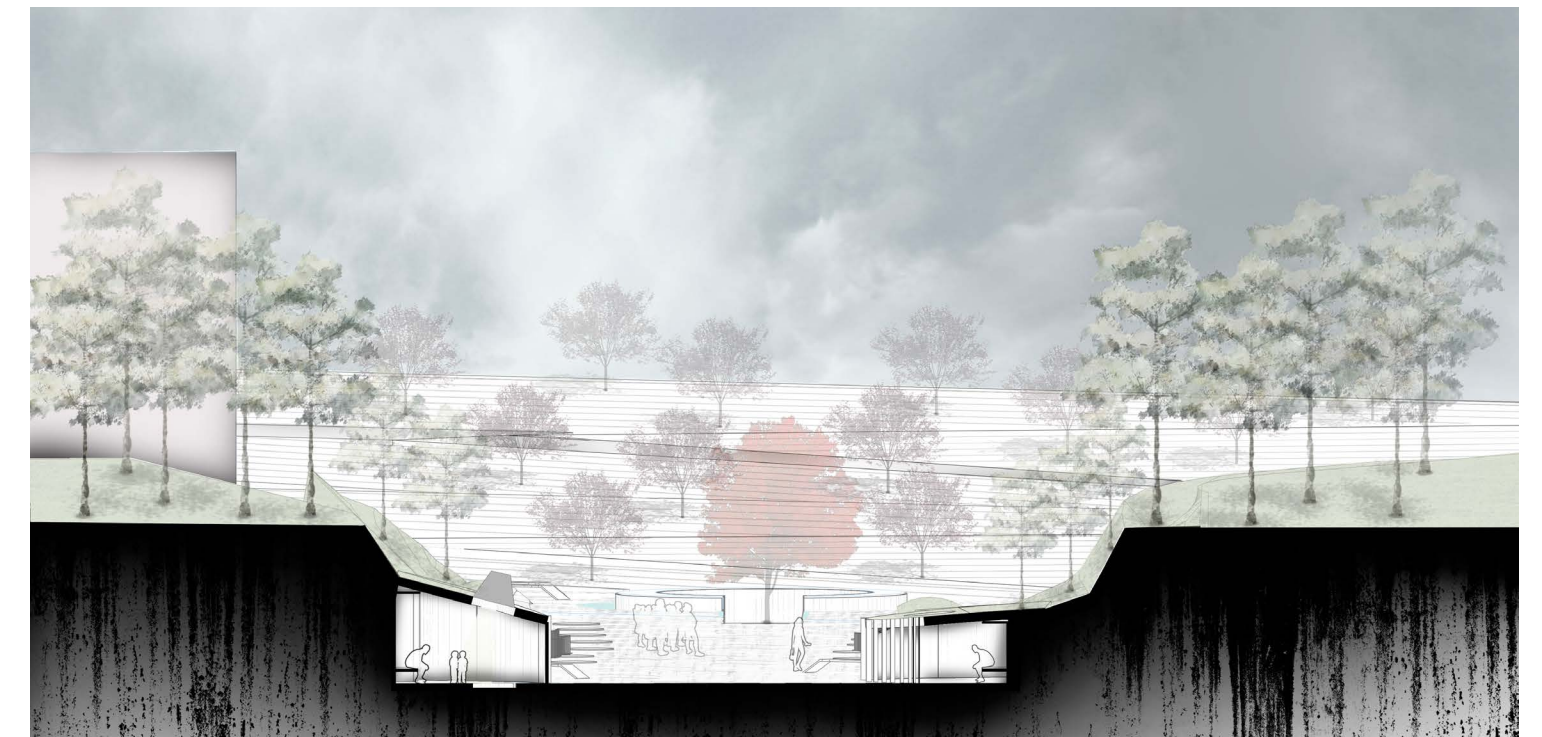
Section Perspective D-D. View towards the ramp-stair across the nest spaces.
